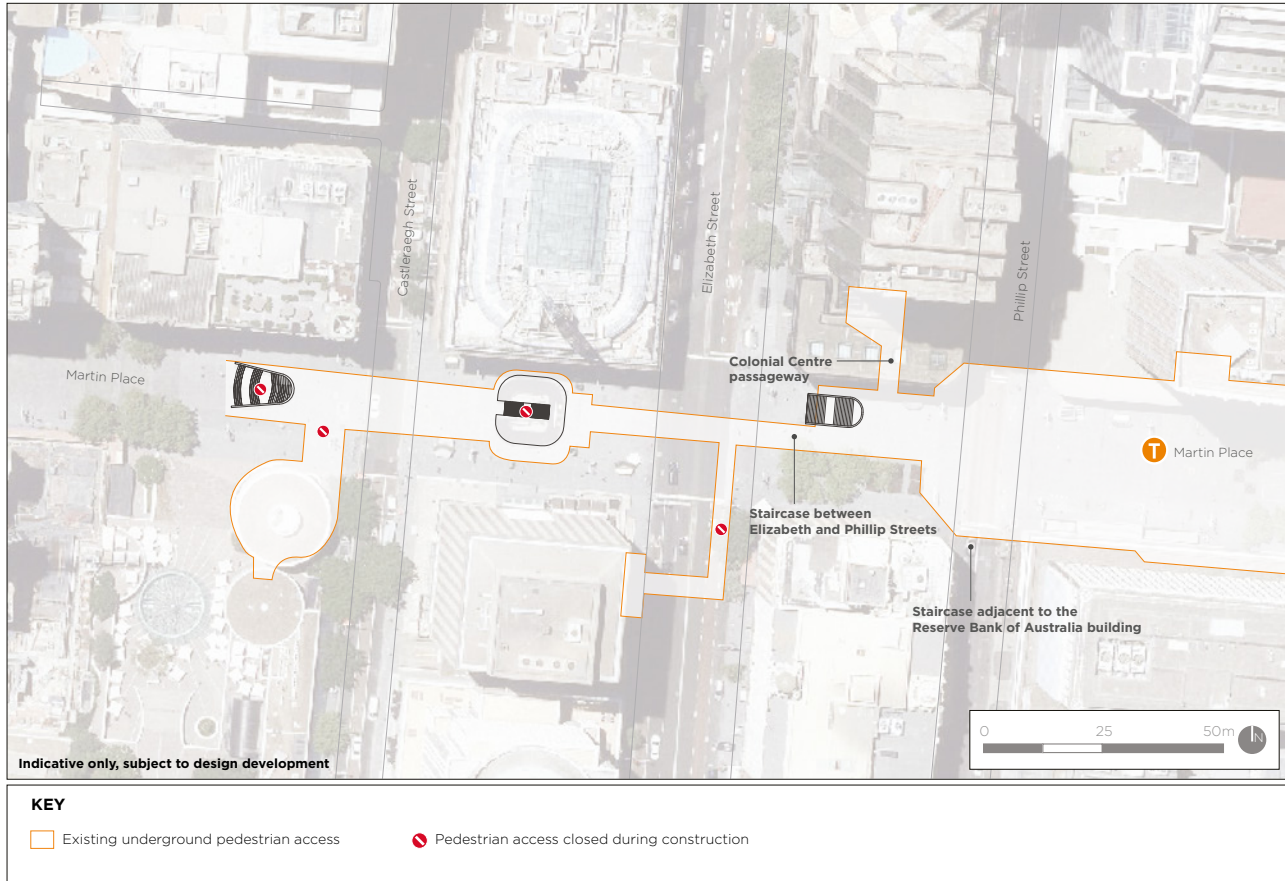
Martin Place Station construction pedestrian access arrangements
